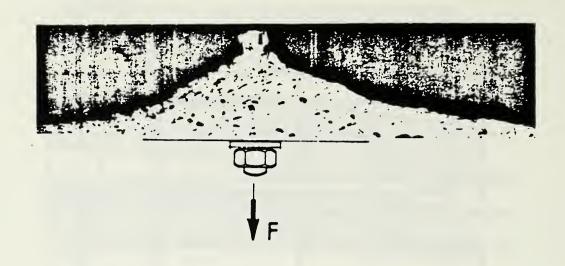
Typical Failure Cone of Expansion Anchors (From [14])
